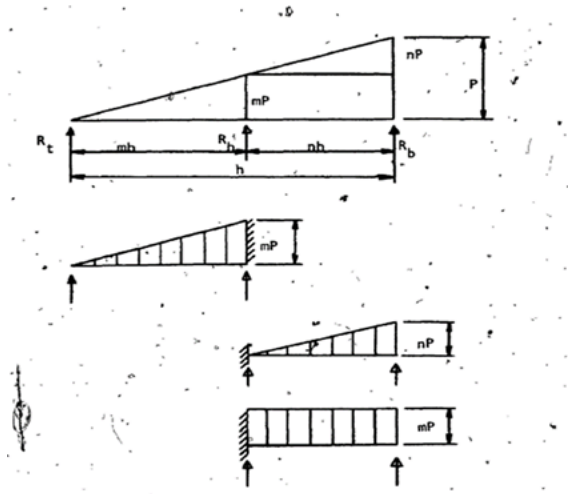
Loading Diagram of Horizontal Stiffeners (Raymond, 1975)
